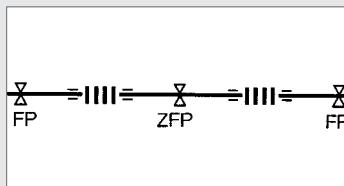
Straight pipe run, subdivided into two compensated sections by intermediate anchors
